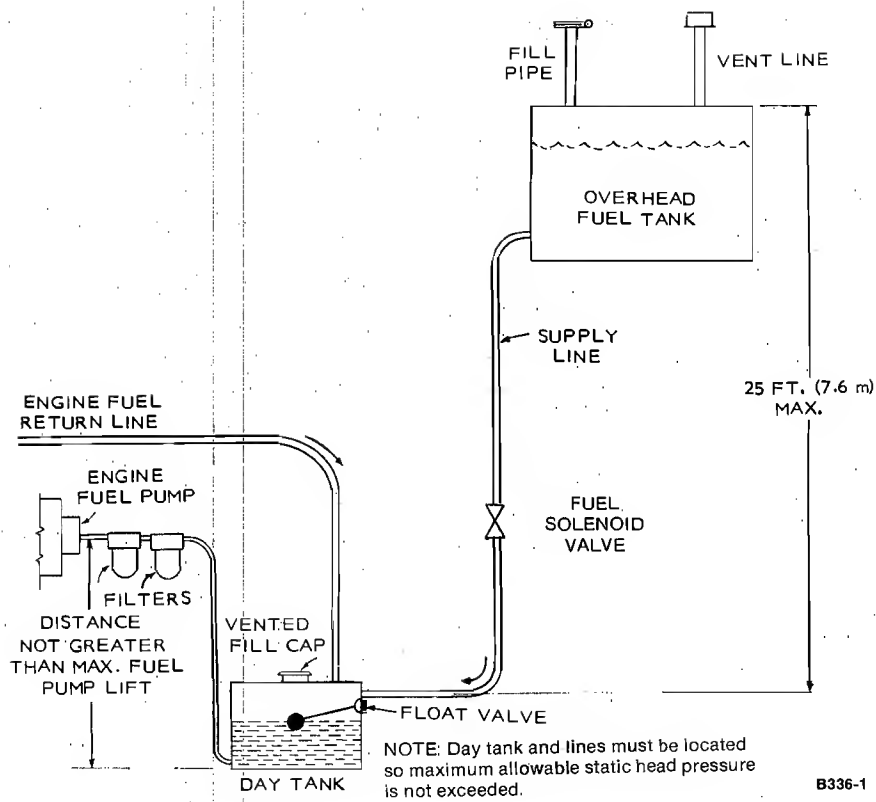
TYPICAL DIESEL FUEL SYSTEM WITH OVERHEAD FUEL TANK
